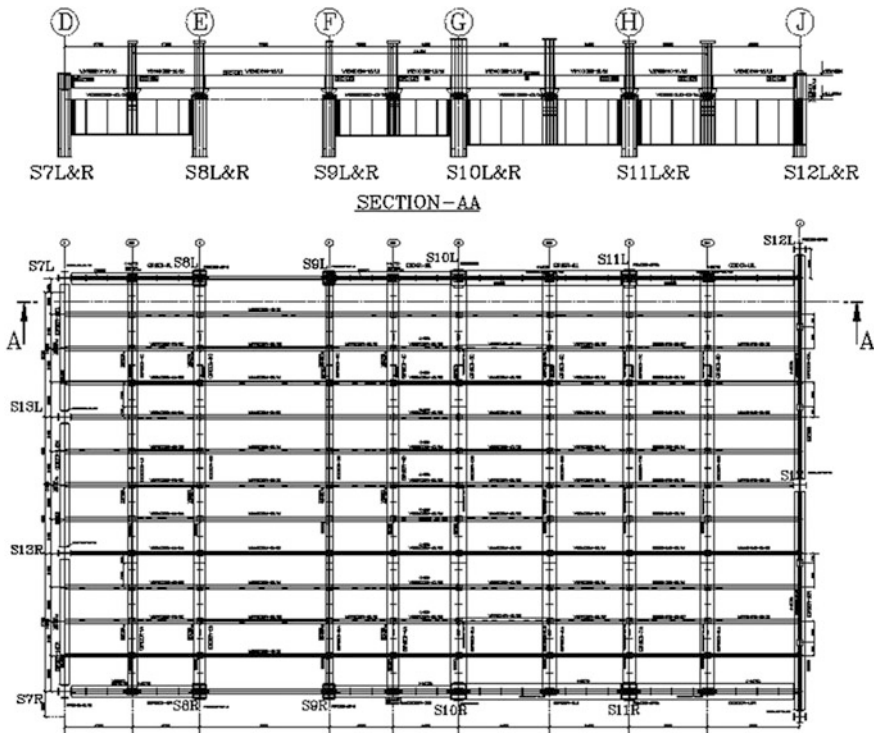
Boiler structural plan at 90.00 m (ceiling level)
